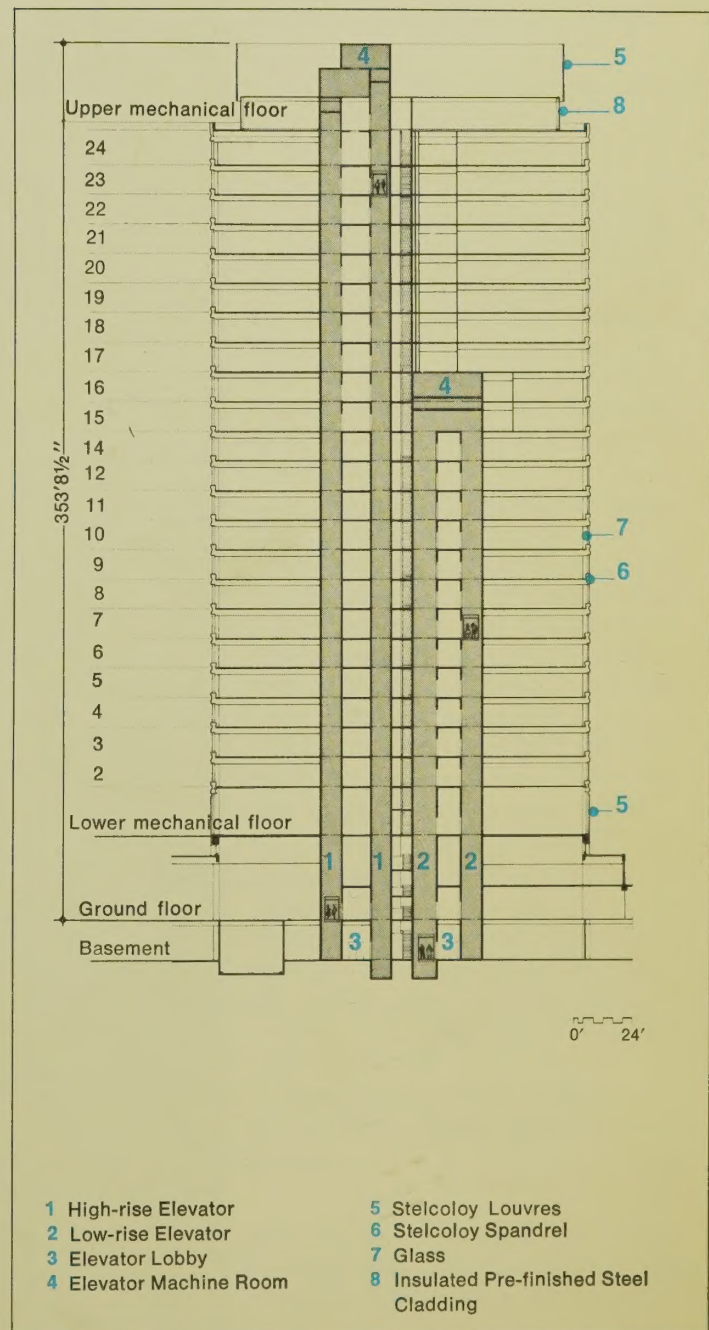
General arrangement for the Stelco Tower elevator system. Four elevators service the first 12 floors and five high-speed units the top 10 floors where Stelco's General offices are located.
